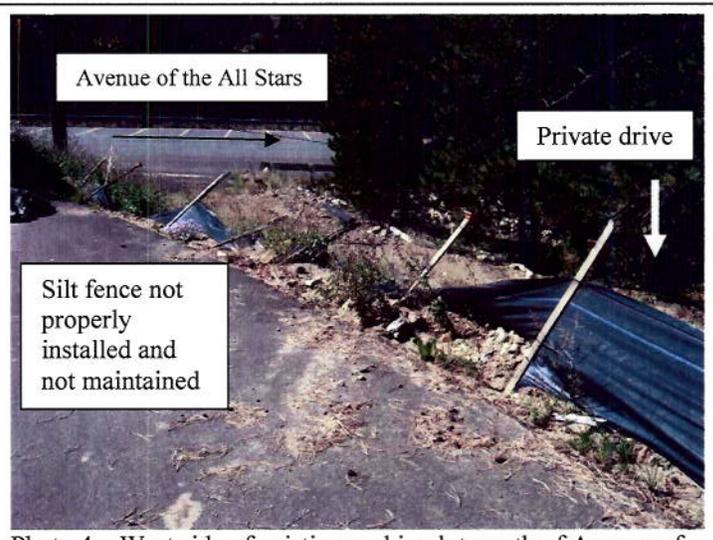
West side of existing parking lot, north of Avenue of the All Stars.
